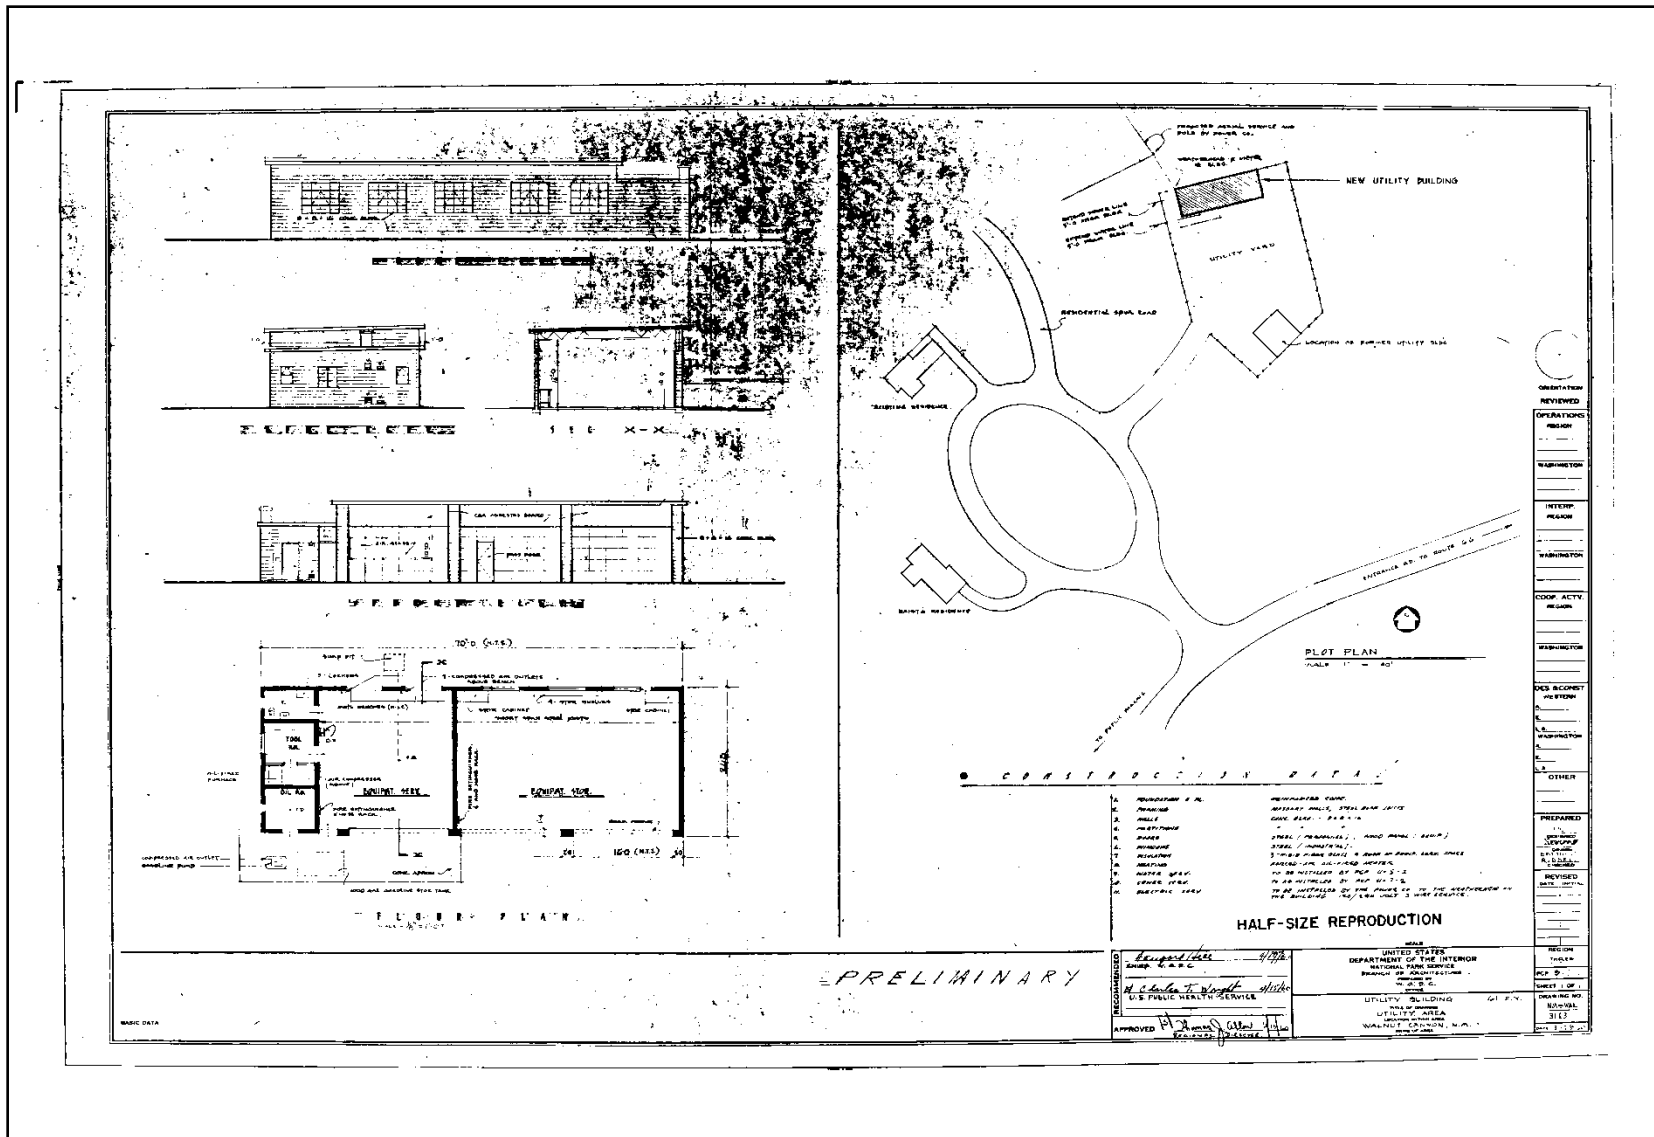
Preliminary floor and plot plans and elevation drawings for Utility Building, 1960 (NPS Dwg NM-WAL 3113).
